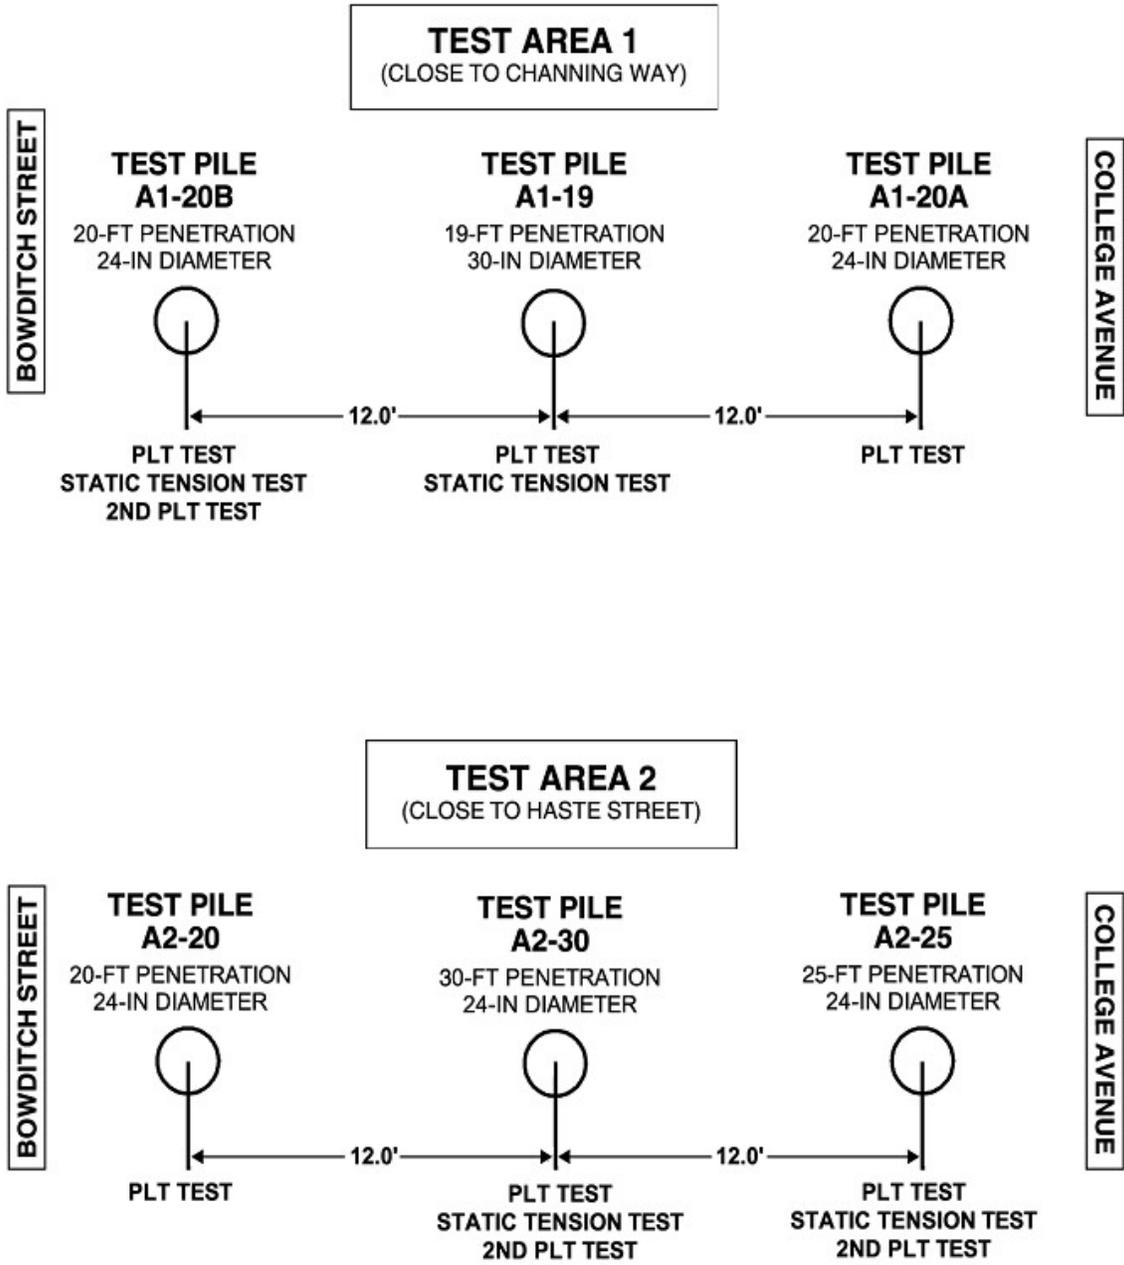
Arrangement of Test Piers, from Kasali (2002)
